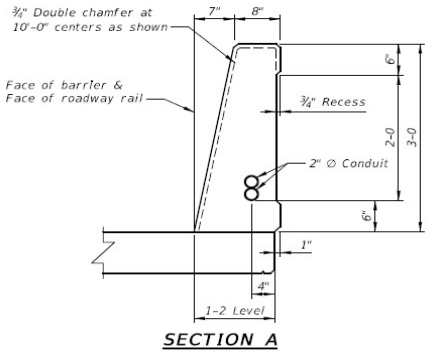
Single Slope Concrete Barrier Bridge Rail, could be 36" or 42": B.RH.01 = S19
